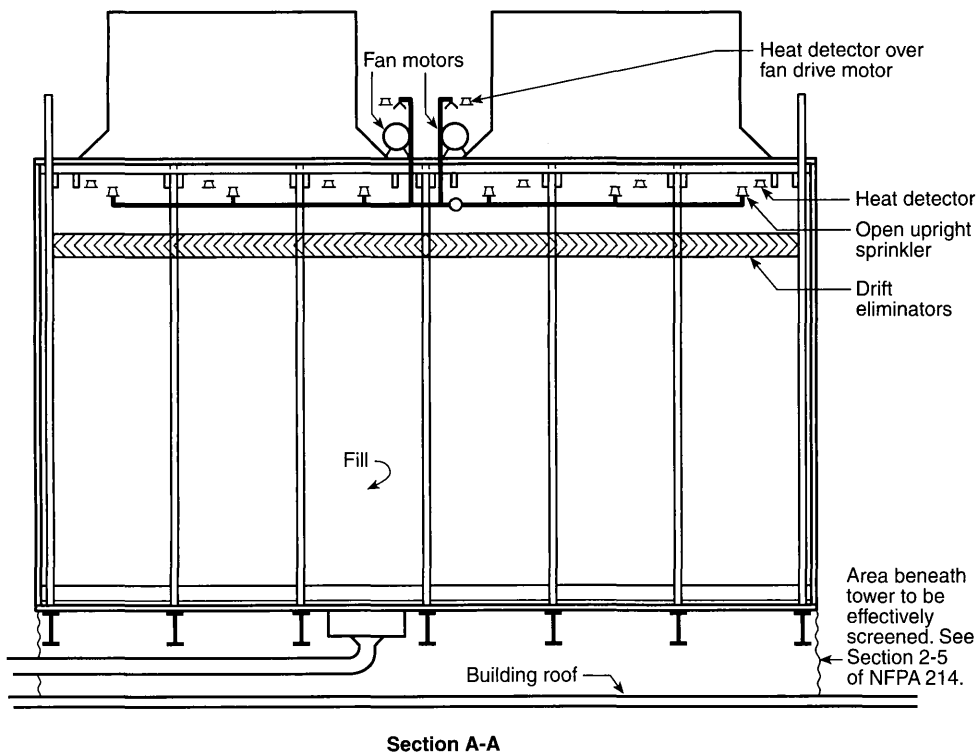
(b) Typical Deluge Fire Protection Arrangement for Counterflow Towers, Illustration 2. [214: Figure A.3.2.4.1(b)]
